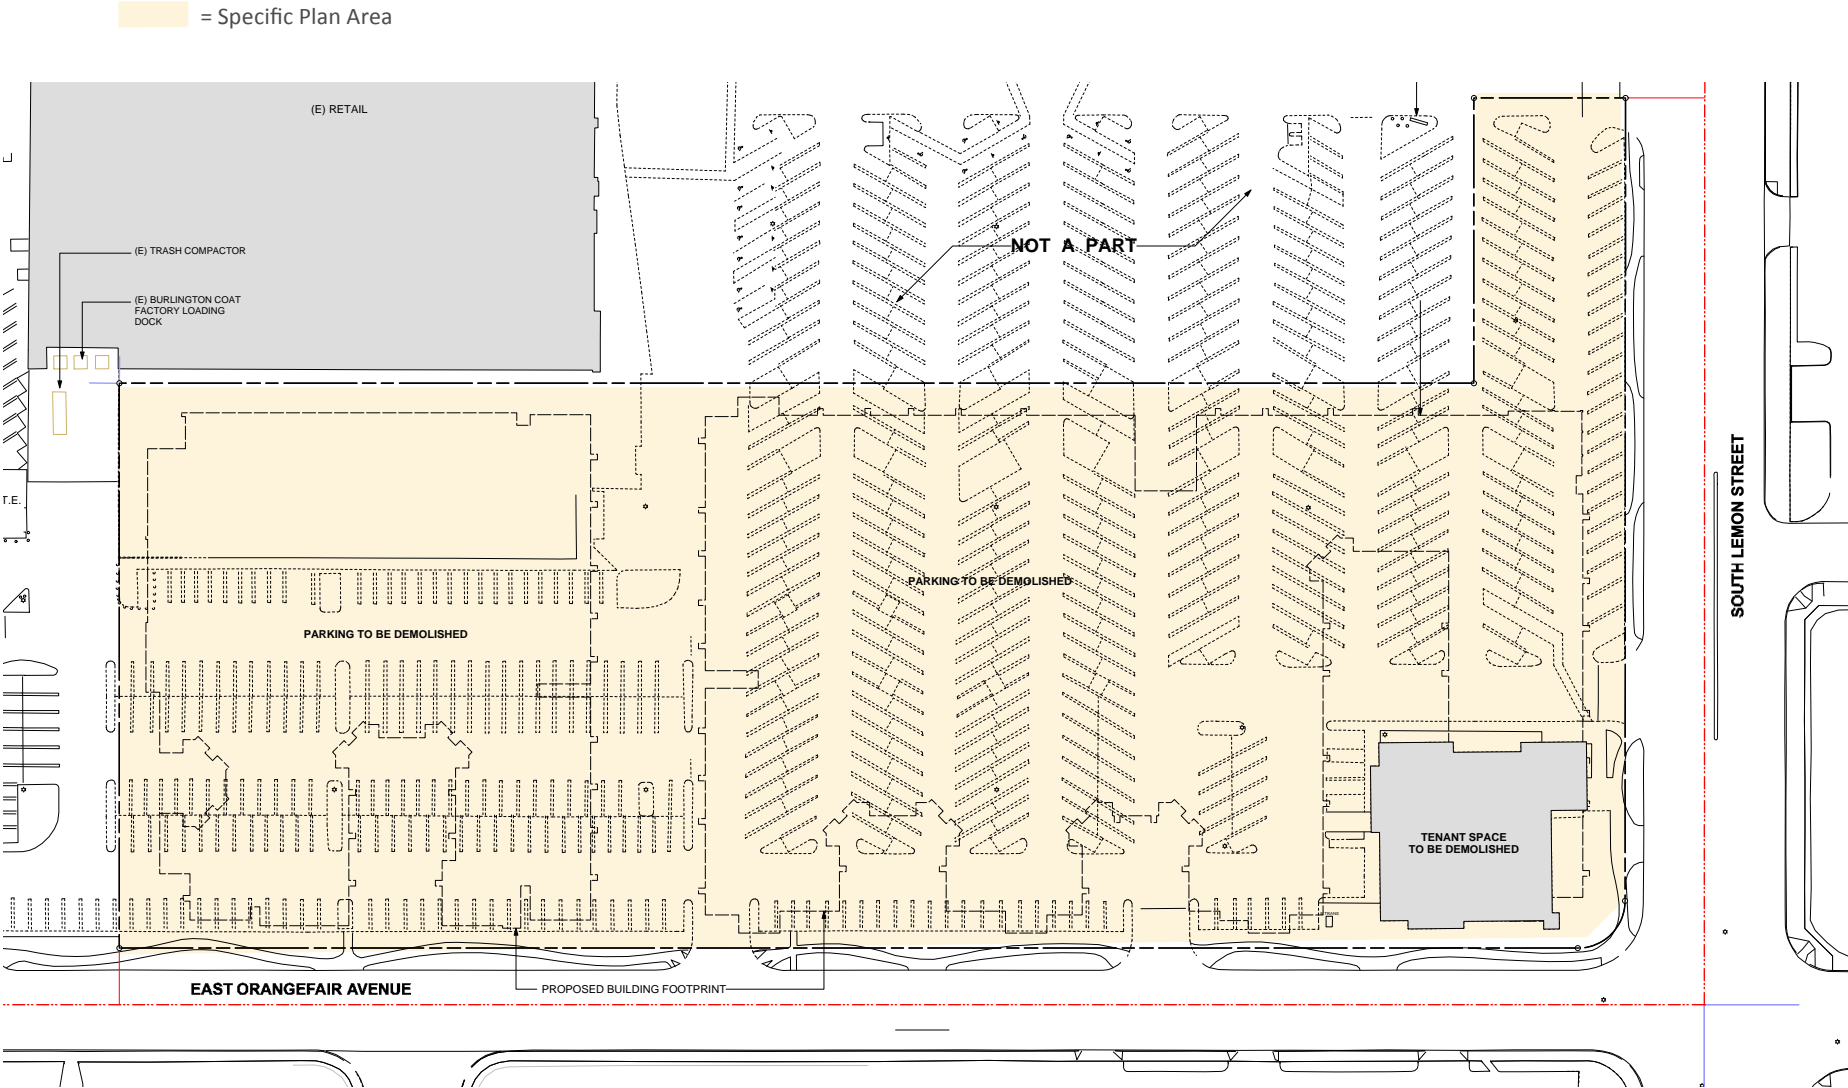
Orangefair Specific Plan Area with existing land uses.
